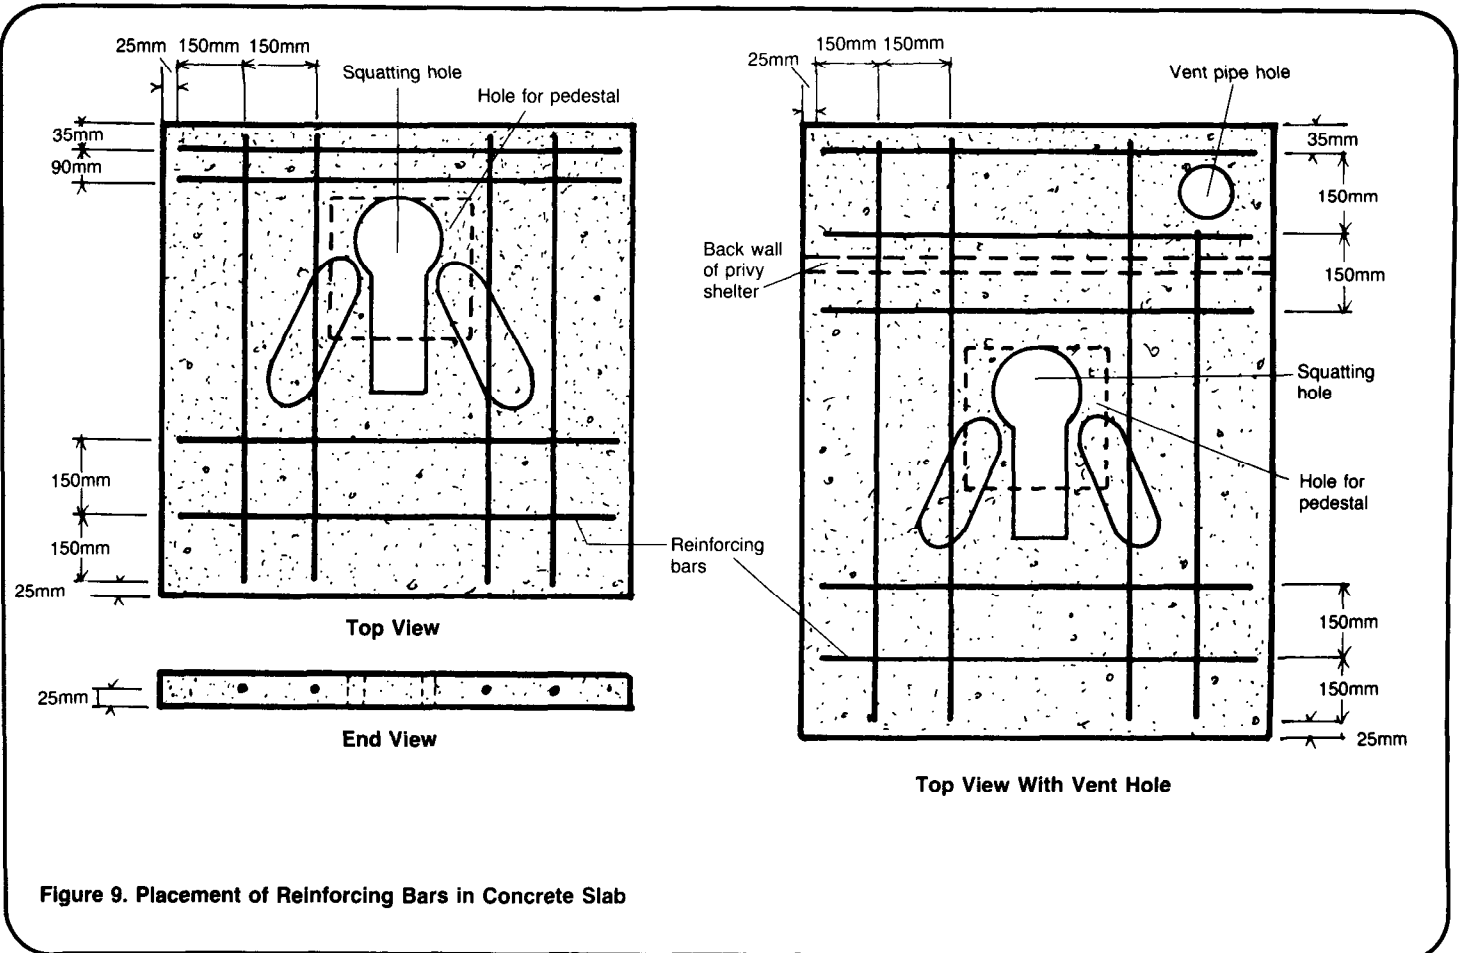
Placement of Reinforcing Bars in Concrete Slab
